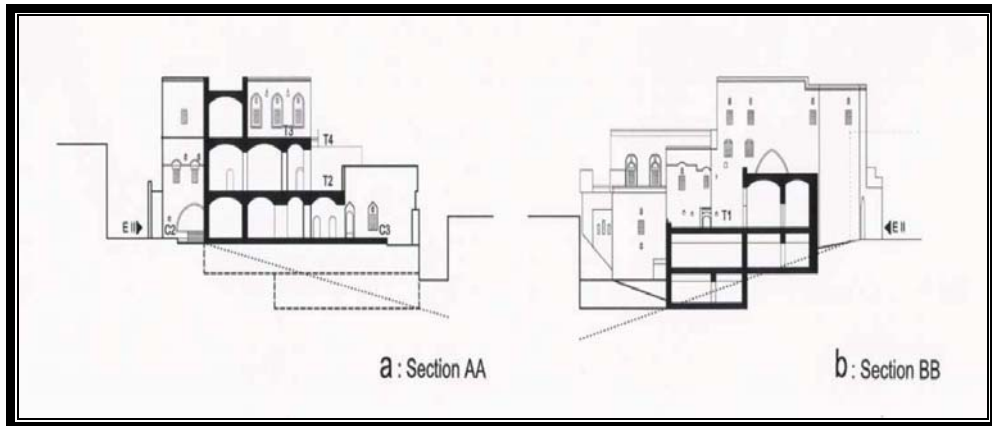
Mungan House of Sections (Gülmez, Ü, N., Uraz, U, T, 2004.8)
